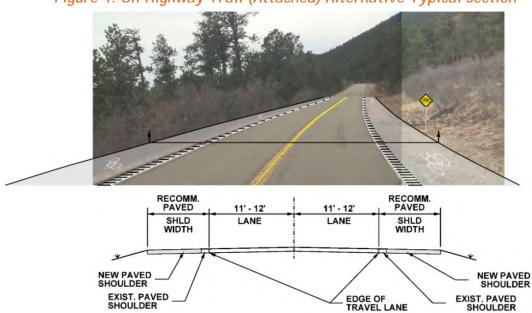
On-Highway Trail (Attached) Alternative Typical Section
